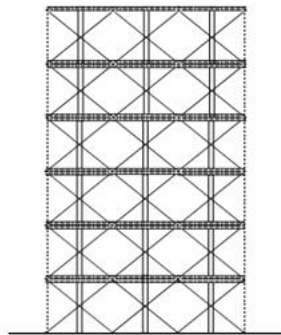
A Planar Shear Wall Modelled by Braced Wide Column Analogy
